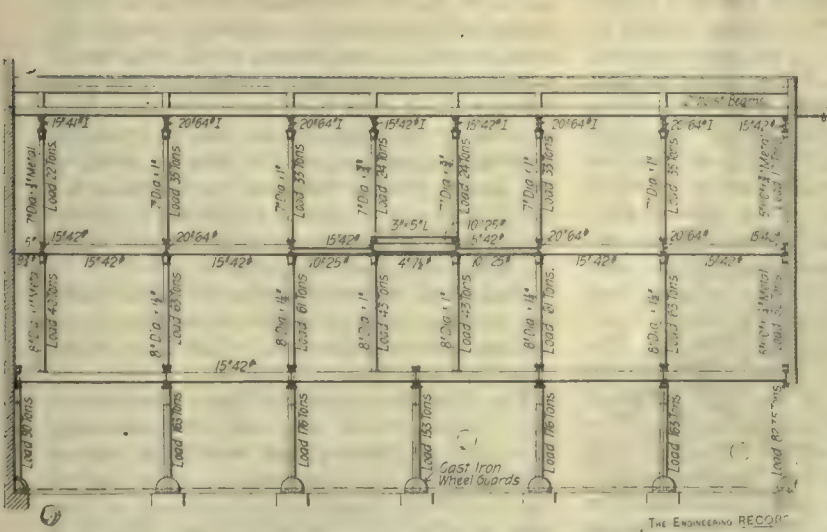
TRANSVERSE ARRANGEMENT OF COLUMNS AND GIRDERS.
